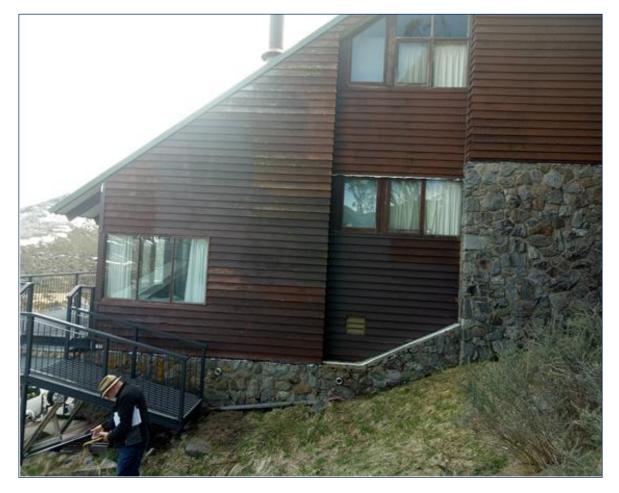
| Existing southwest wall of the Doorack Ski Lodge (Source: Applicant's documentation)
